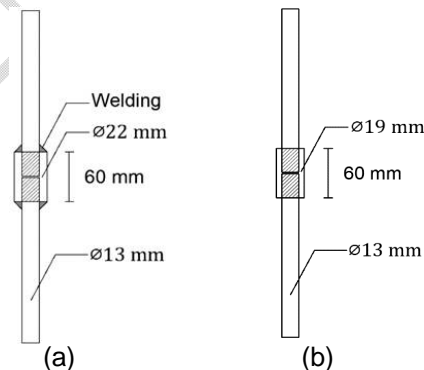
(a) Coupler splice details on B-13C22W (b) Coupler splice details on B-13C19
